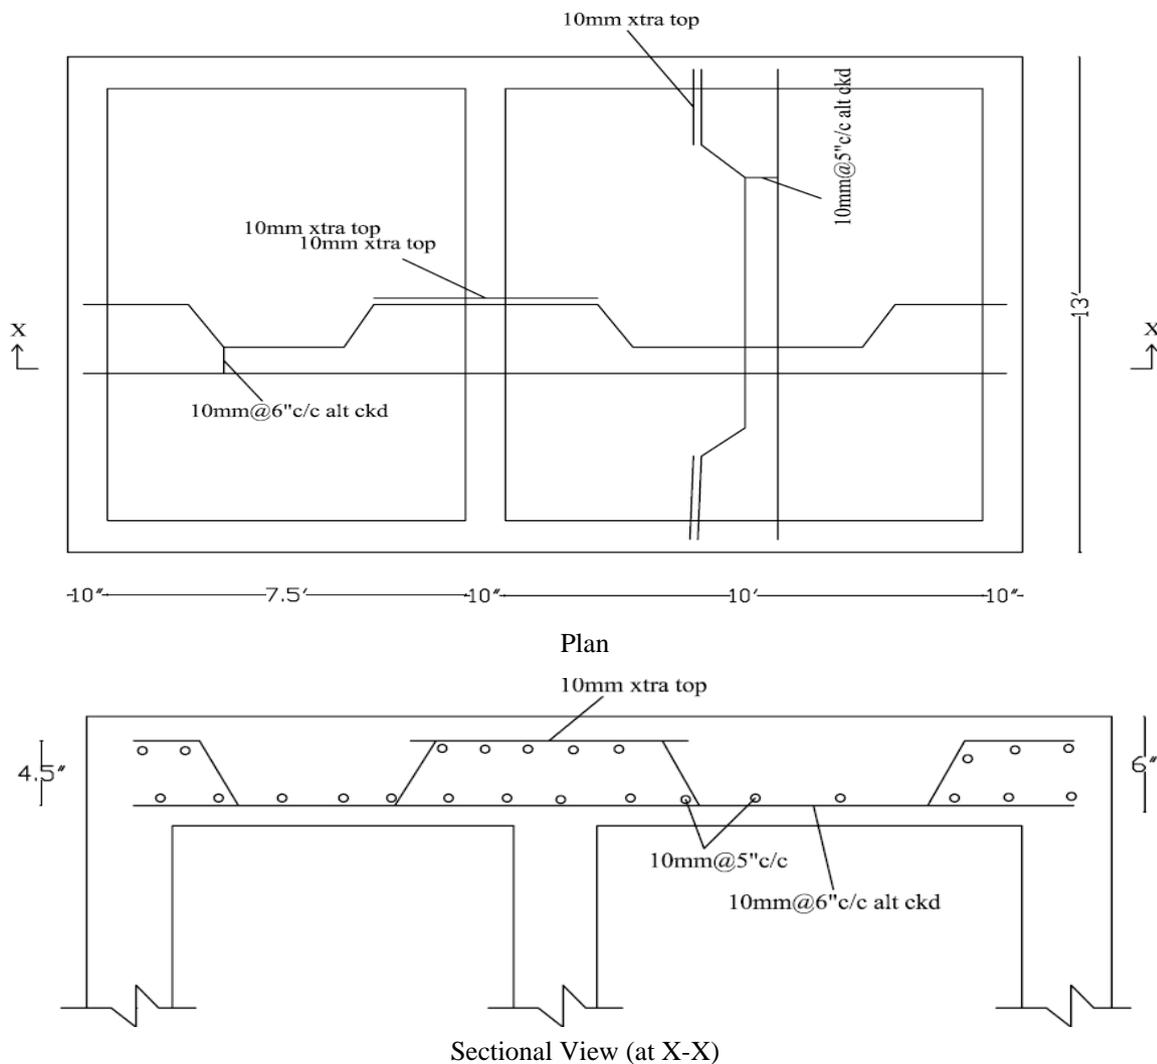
(Plan and Sectional view for the RCC Slab)
